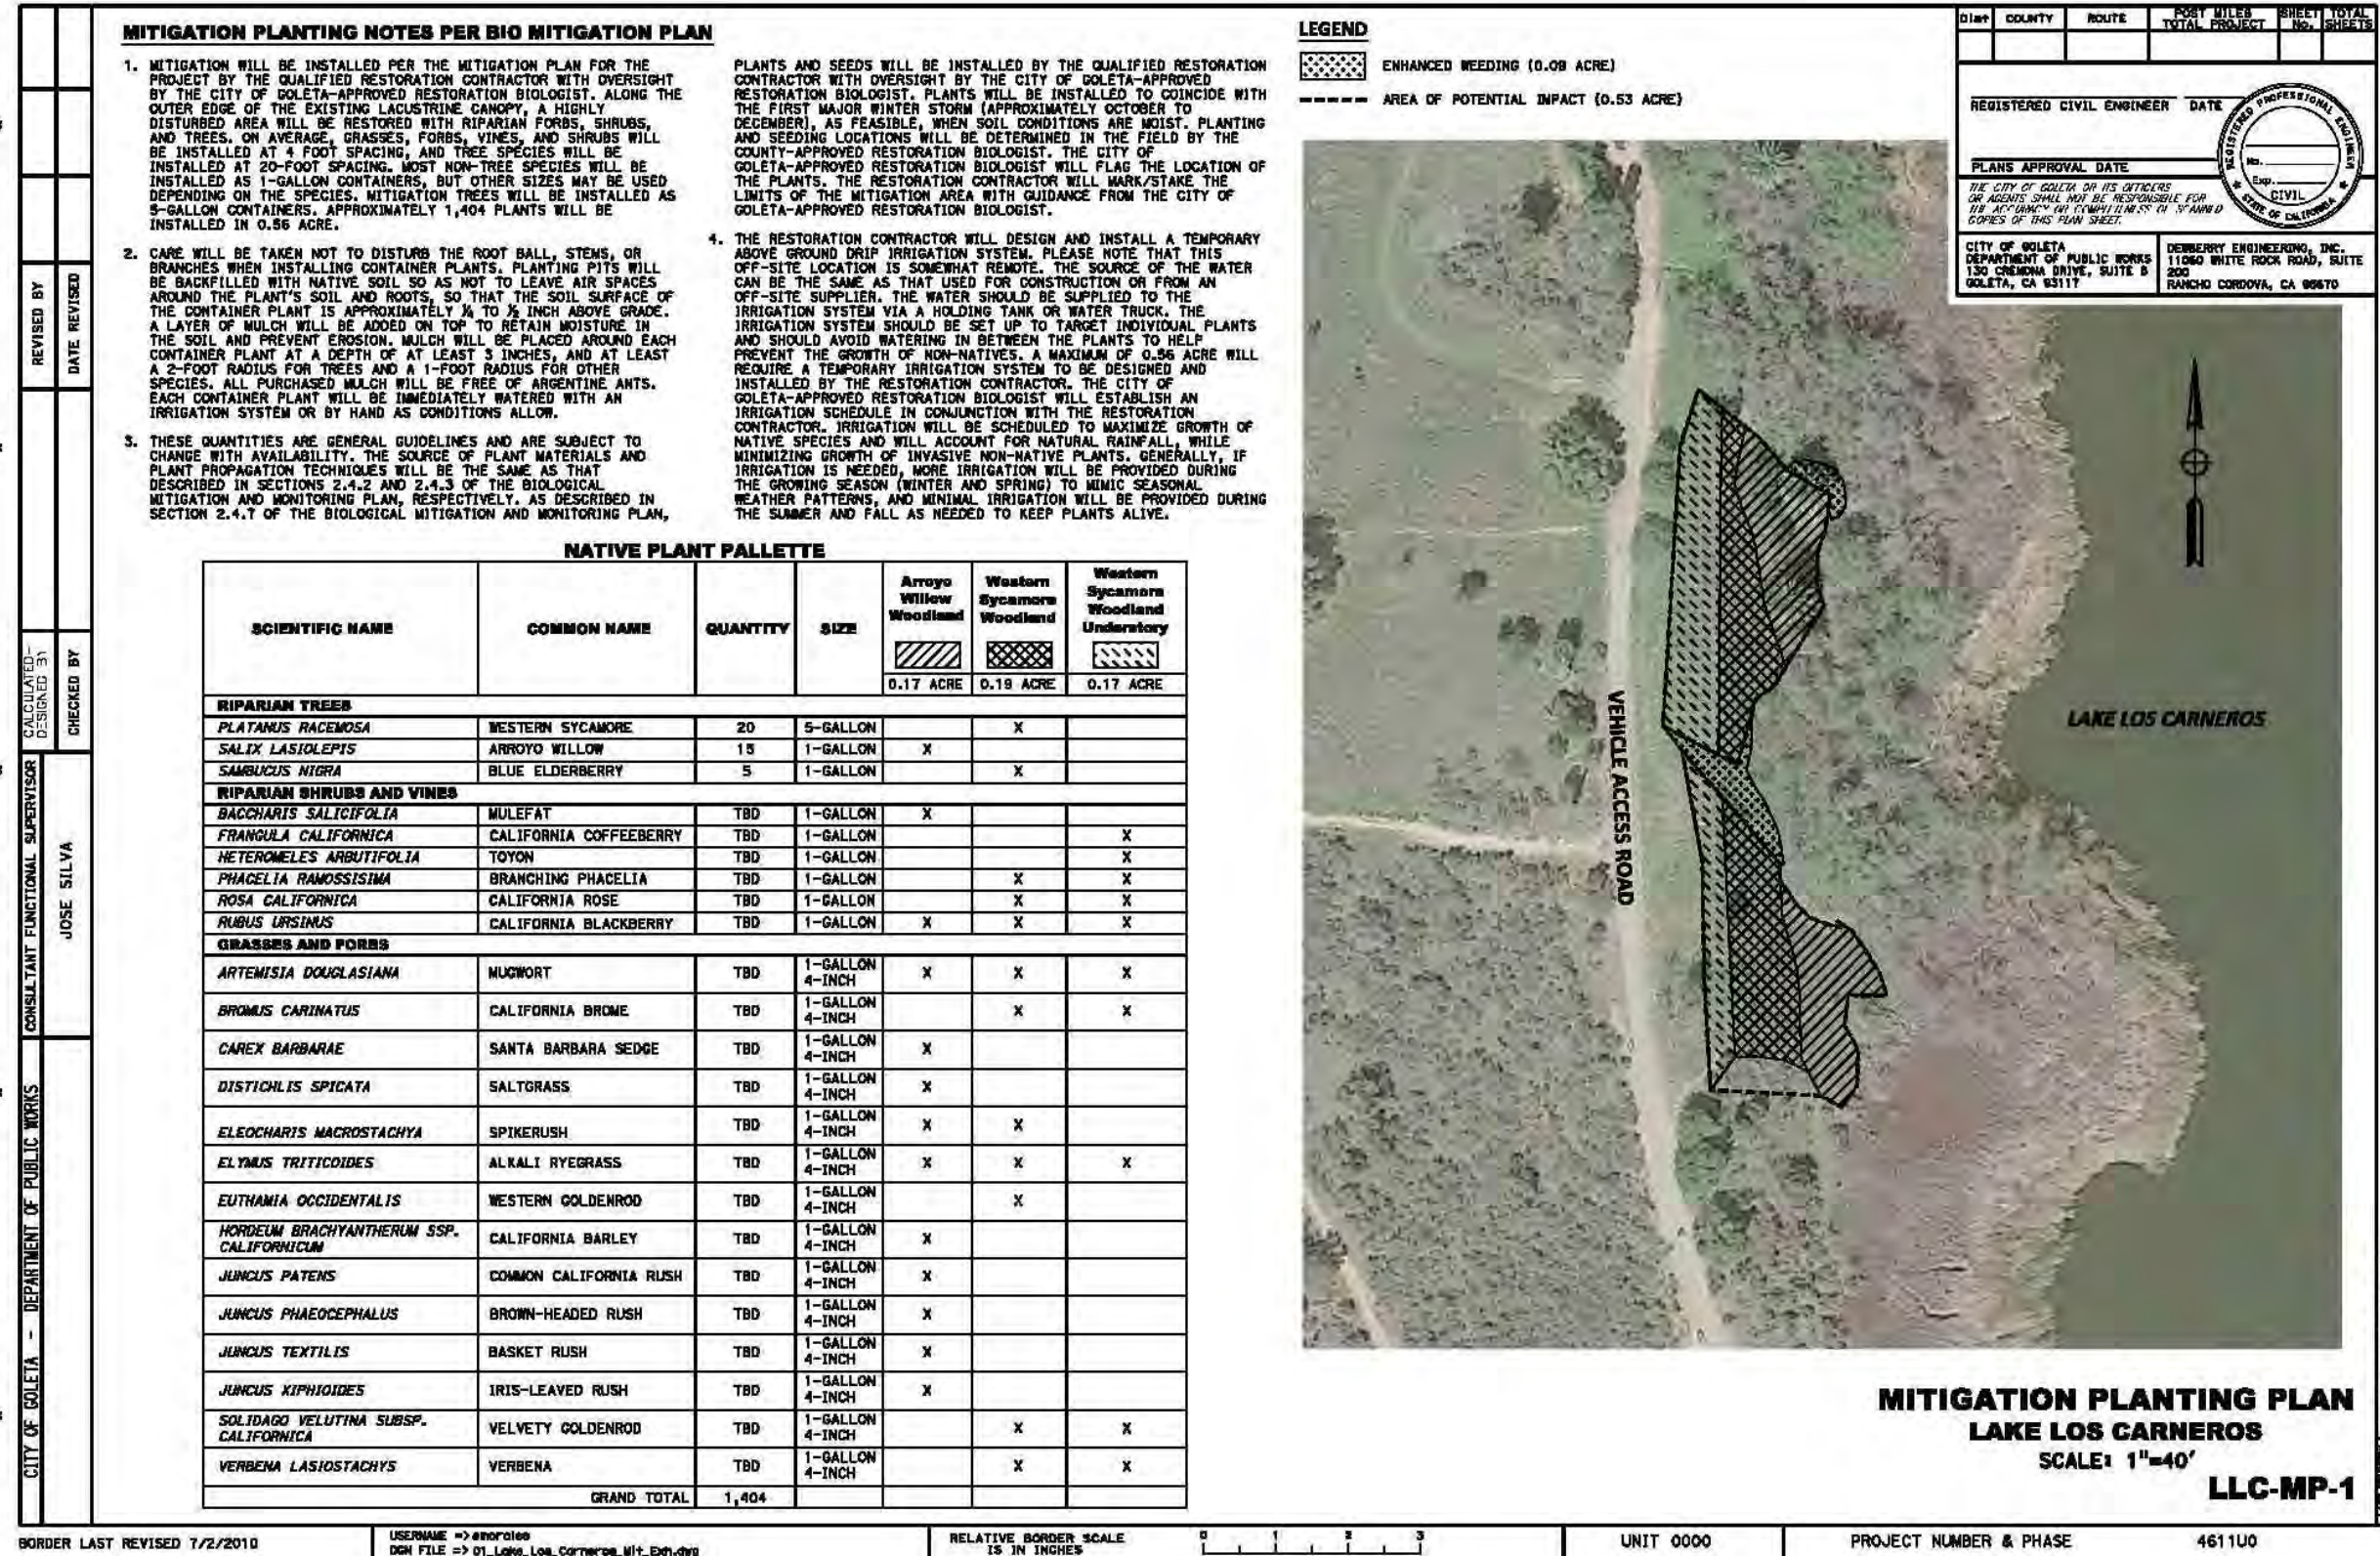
Lake Los Carneros – Engineering Planting Plan (Dewberry | Drake Haglan 2022)
